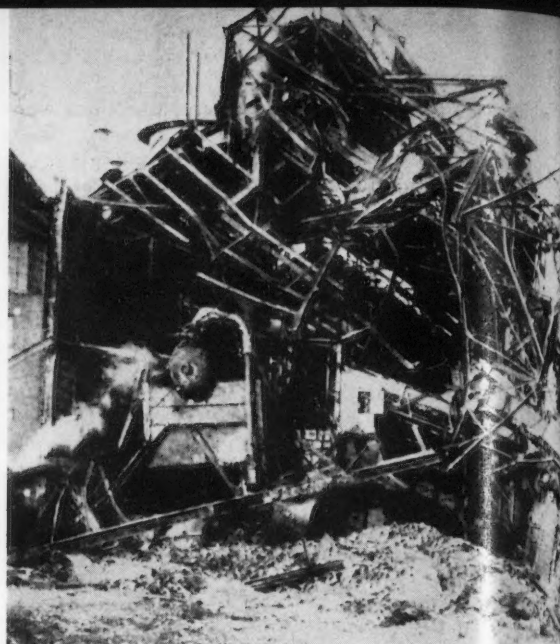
Power plant after explosion due to caustic embrittlement of steam boiler.²¹
